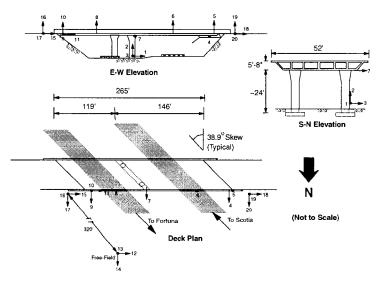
US 101/Painter Street Overpass: Structural details and sensor locations.
